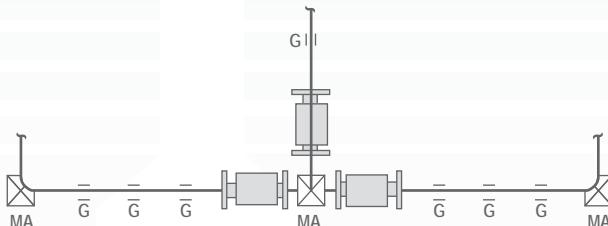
shows the proper use of a three single MX expansion joints to absorb axial pipe line expansion with a branch connection. Main anchors (MA) are located at changes in pipe direction. Only one expansion joint should be installed between anchors and preferably within four pipe diameters of an anchor. Pipe guides (G) are located in accordance with table below.
